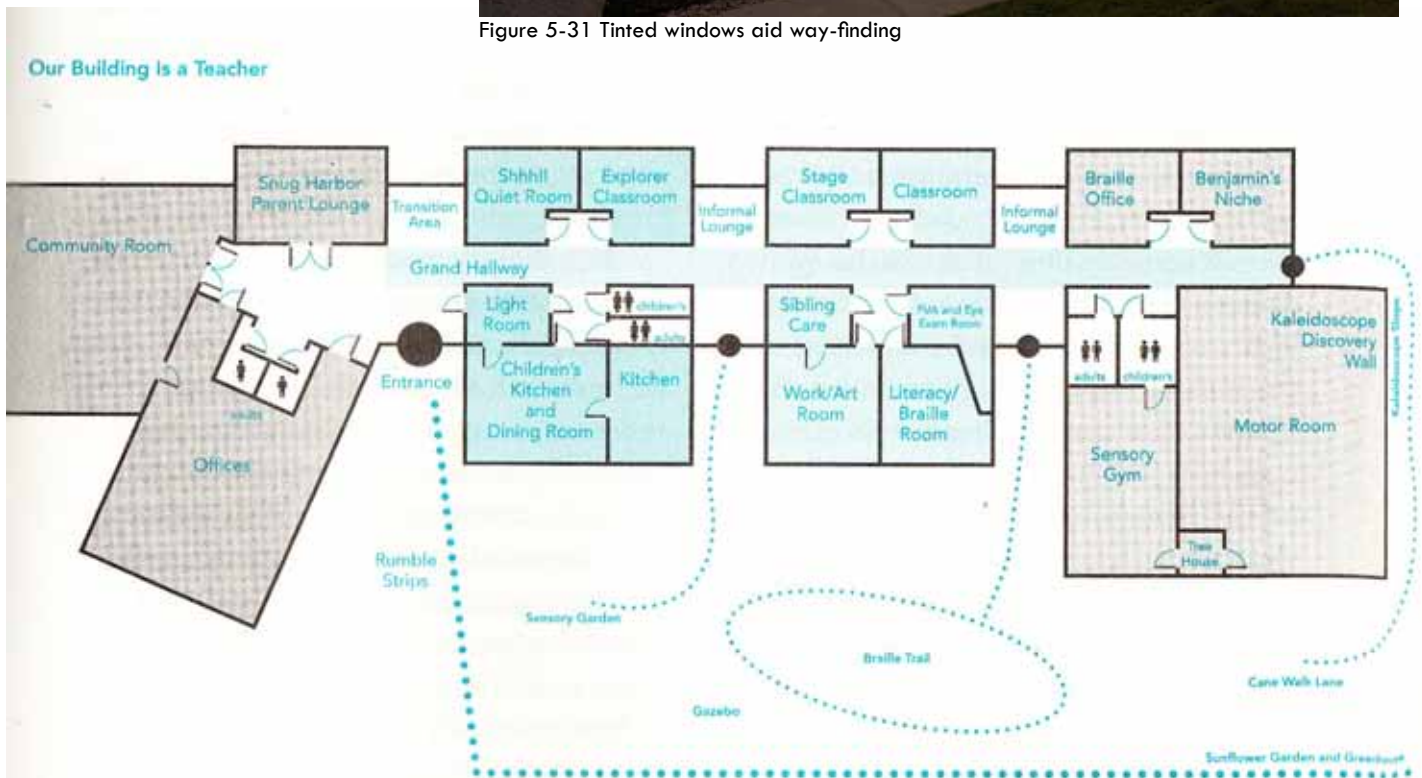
Floor plan of Anchor Centre for Blind Children to indicate the various zones of the building
